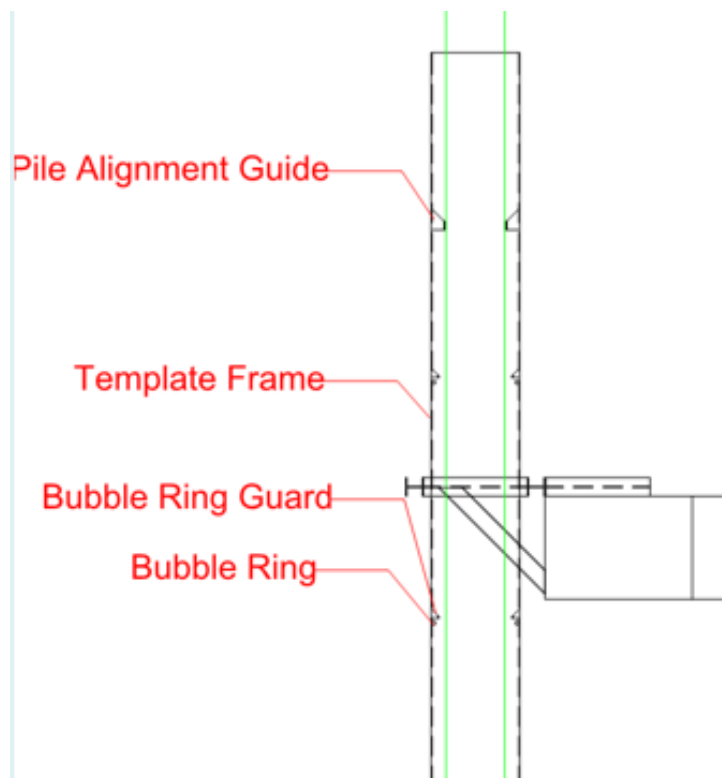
Template configuration used for installation of confined casing system used for permanent piles. A subset of the 48-in piles will require a short duration of re-strike pile driving to prove pile axial capacity (i.e., ensuring that the pile can withstand the planned weight/load without failure or
